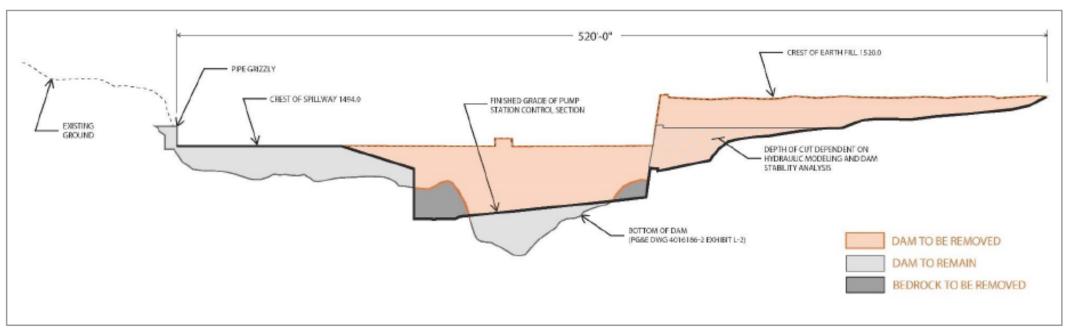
Cape Horn Dam Control Section with Pump Station - Final Dam Removal (Cross Section Through Dam)
